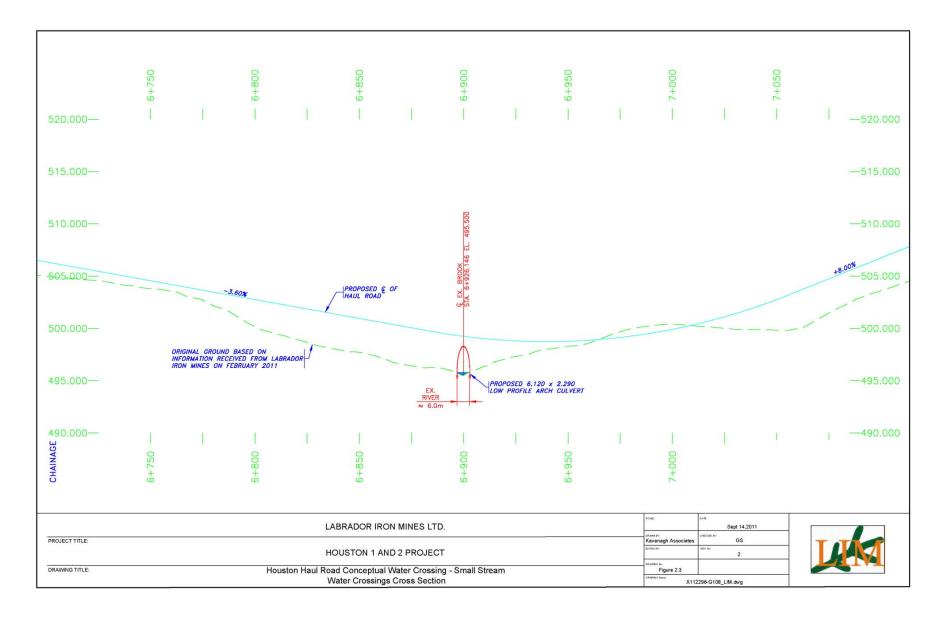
Houston Haul Road Conceptual Water Crossing -Small Stream Water Crossings Cross Section
